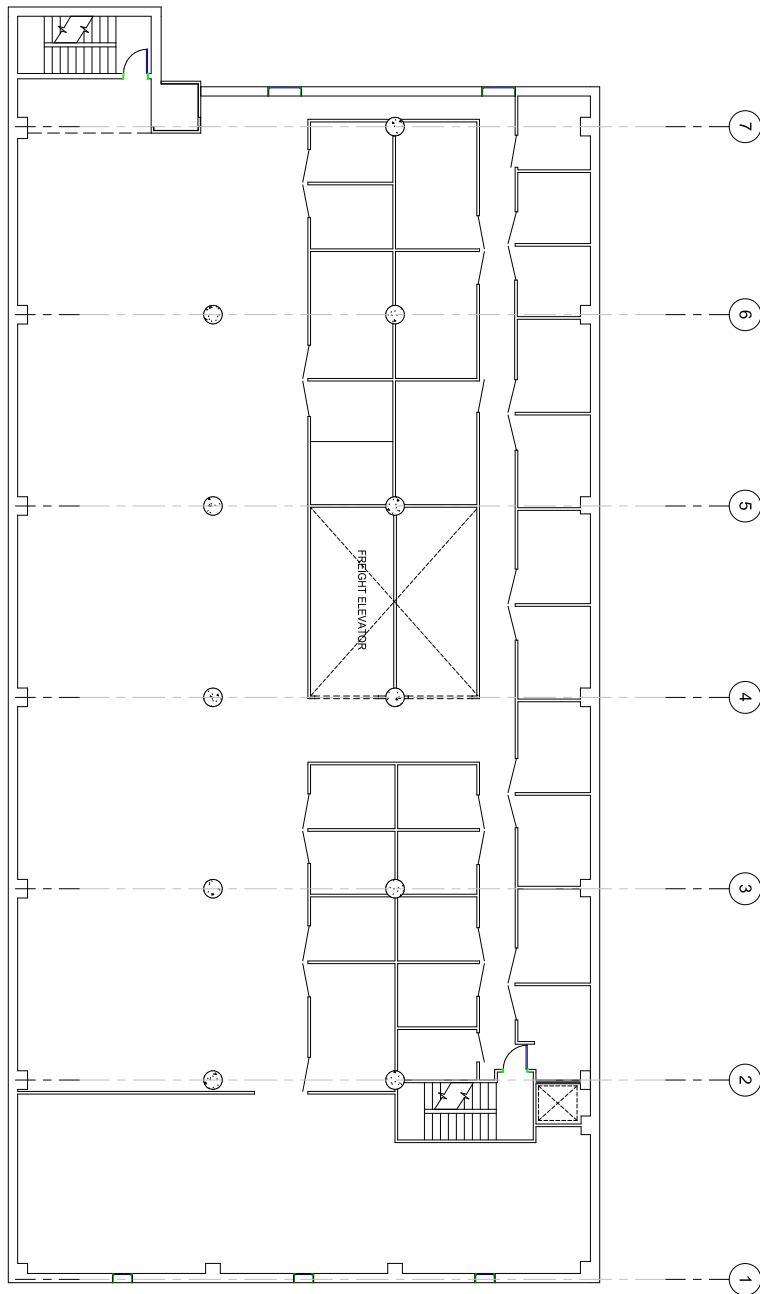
As-Built Fifth Floor Plan. (WILDESIGN Architects, 2018)
